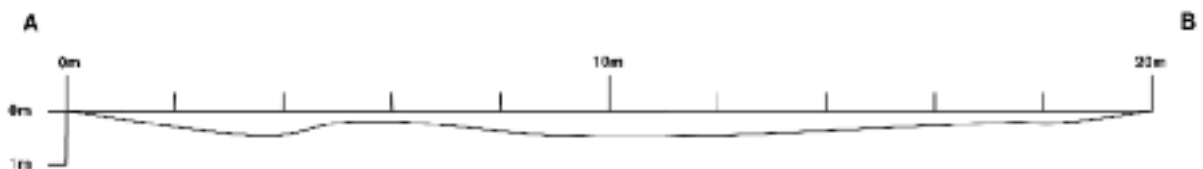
Cross section of a new pond with gently sloping profile at a former gravel pit.
